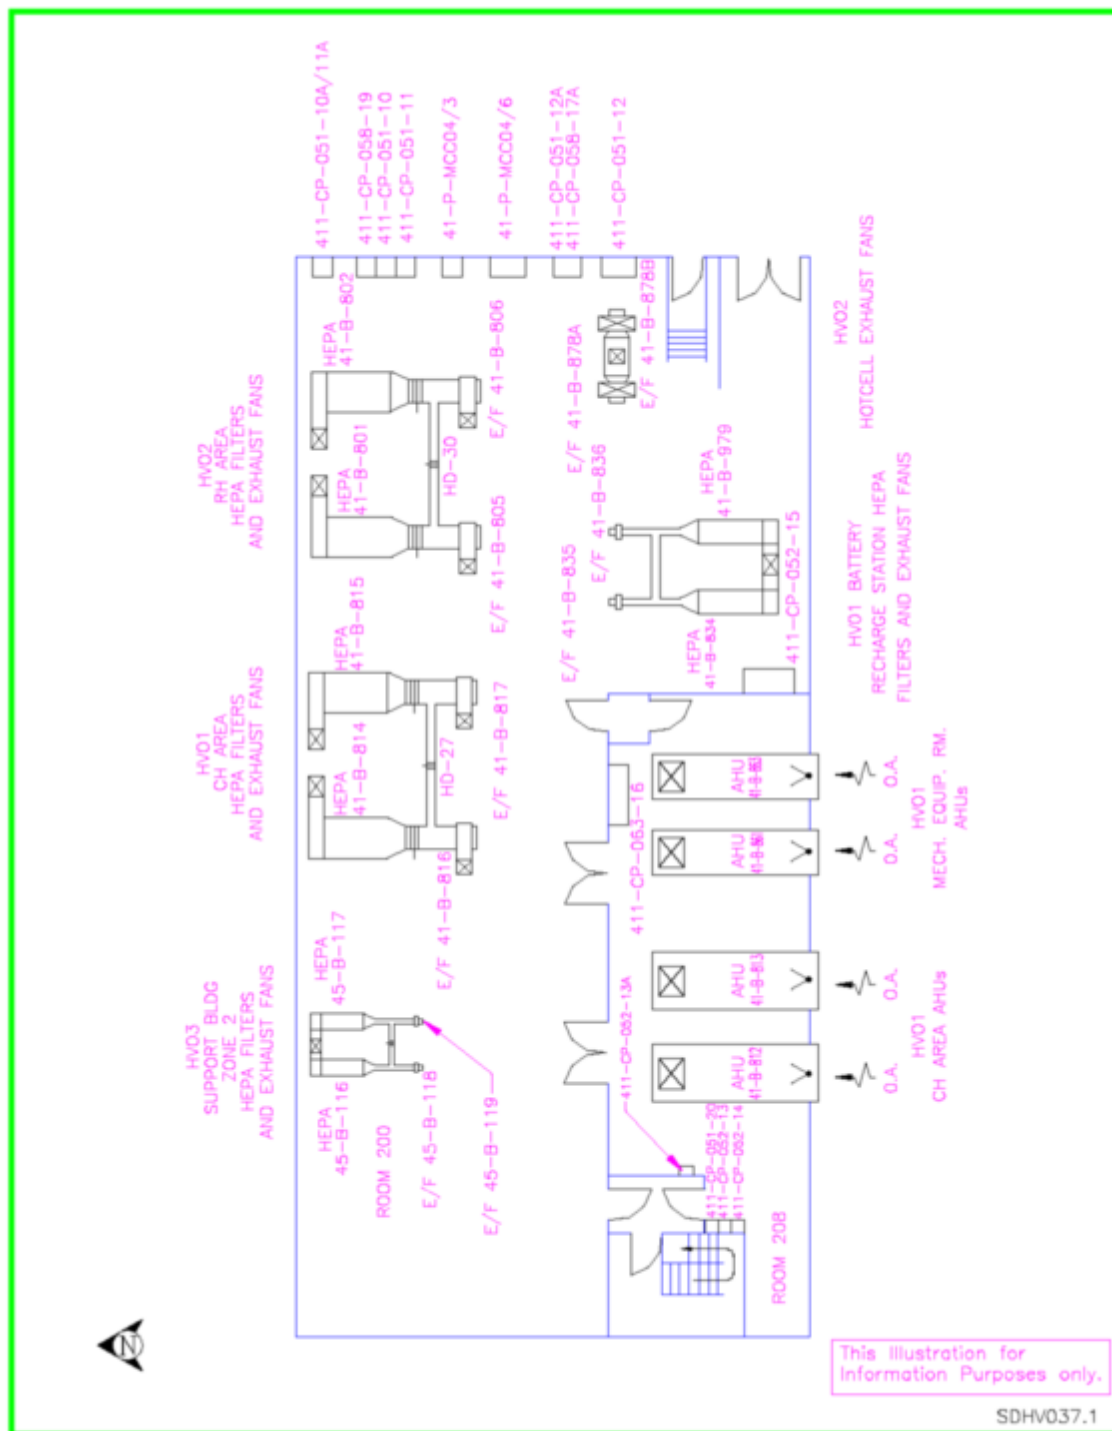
Layout of HV01, HV02 & HV03 Components in the Mechanical Equipment Room
